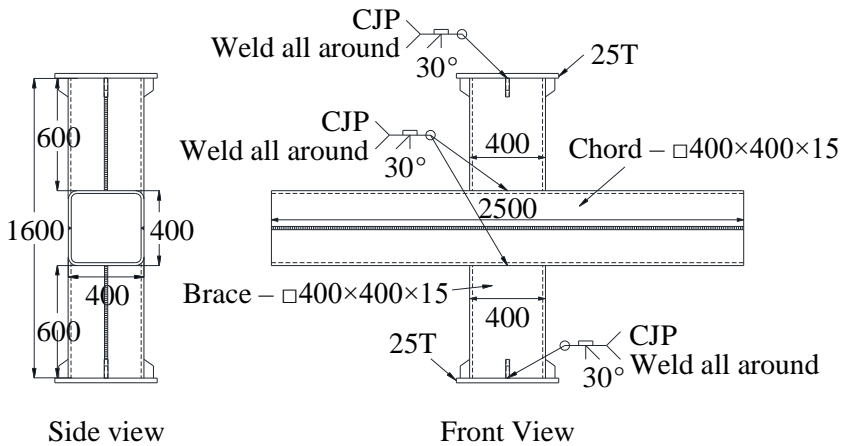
Drawing of the geometry of specimen #5 and specimen #6
